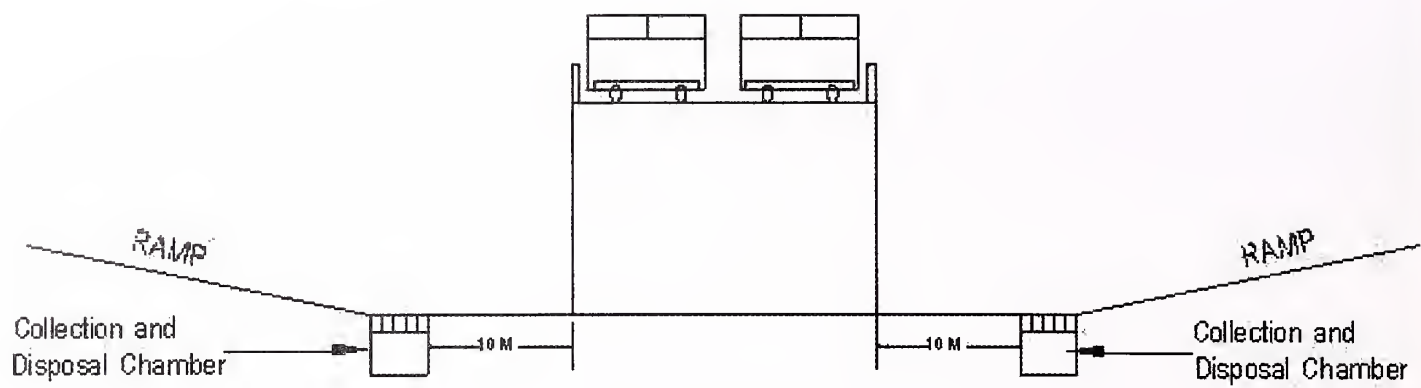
(b) A Typical Cross-Section of Drainage in Subway
